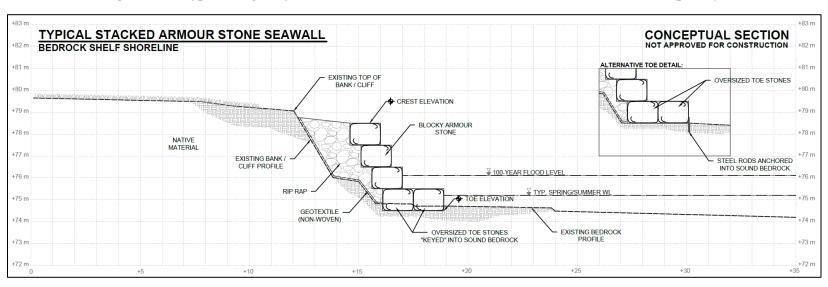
Typical stacked armour stone seawall founded on a bedrock shelf (concept only)
